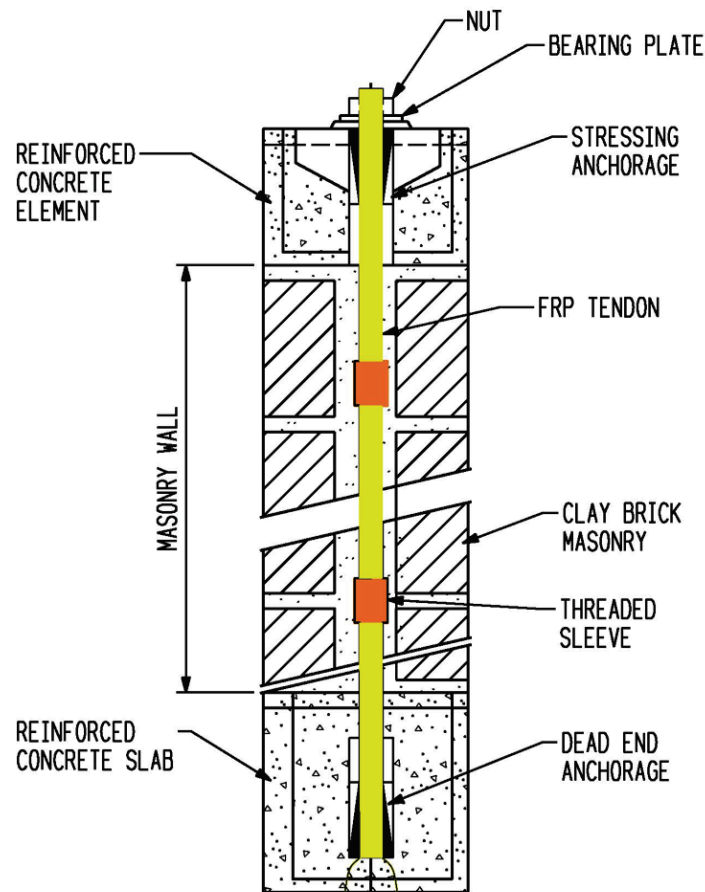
Section through a Post-tensioned Masonry Wall (VSL1990)
